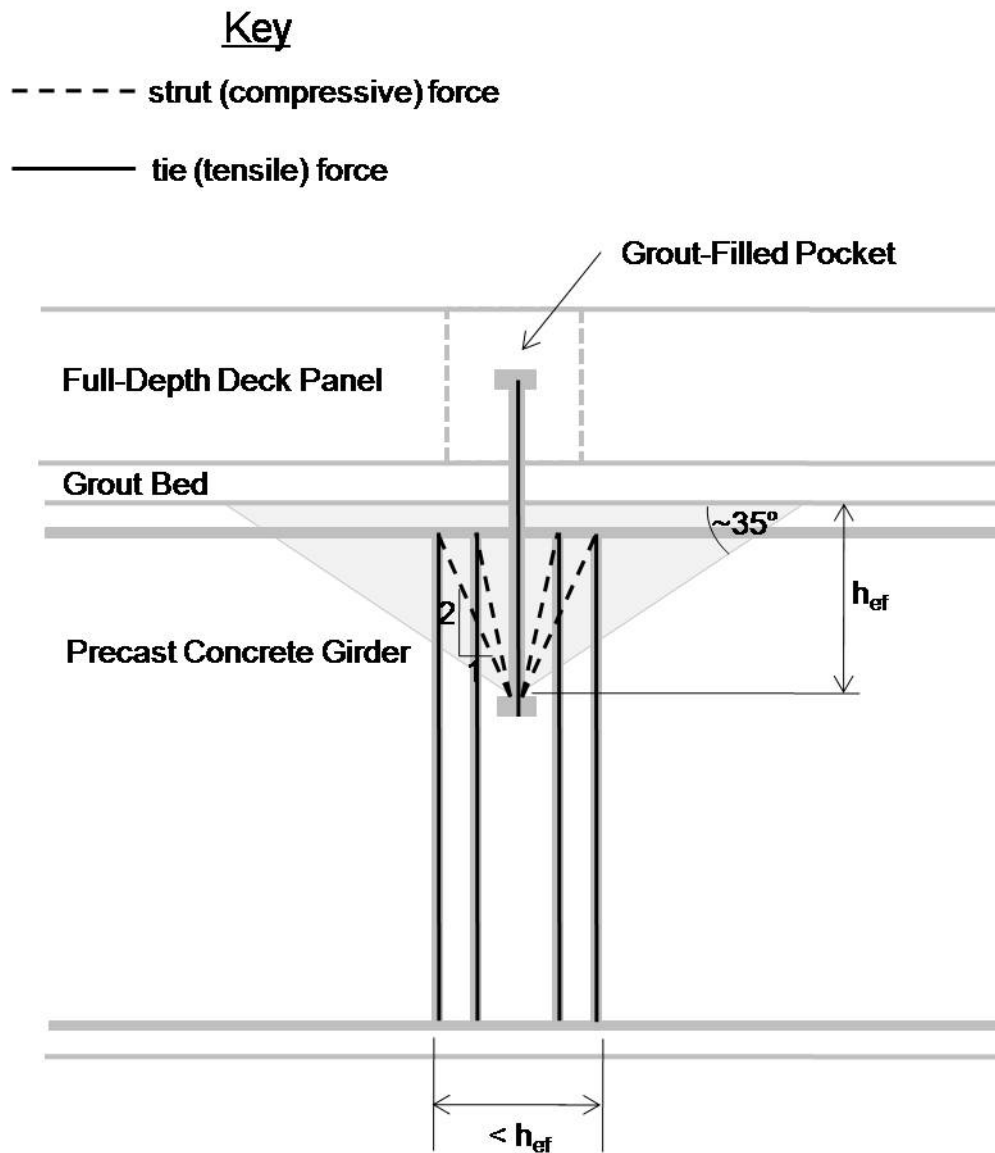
Detailing of beam shear reinforcement required for each shear connection.
